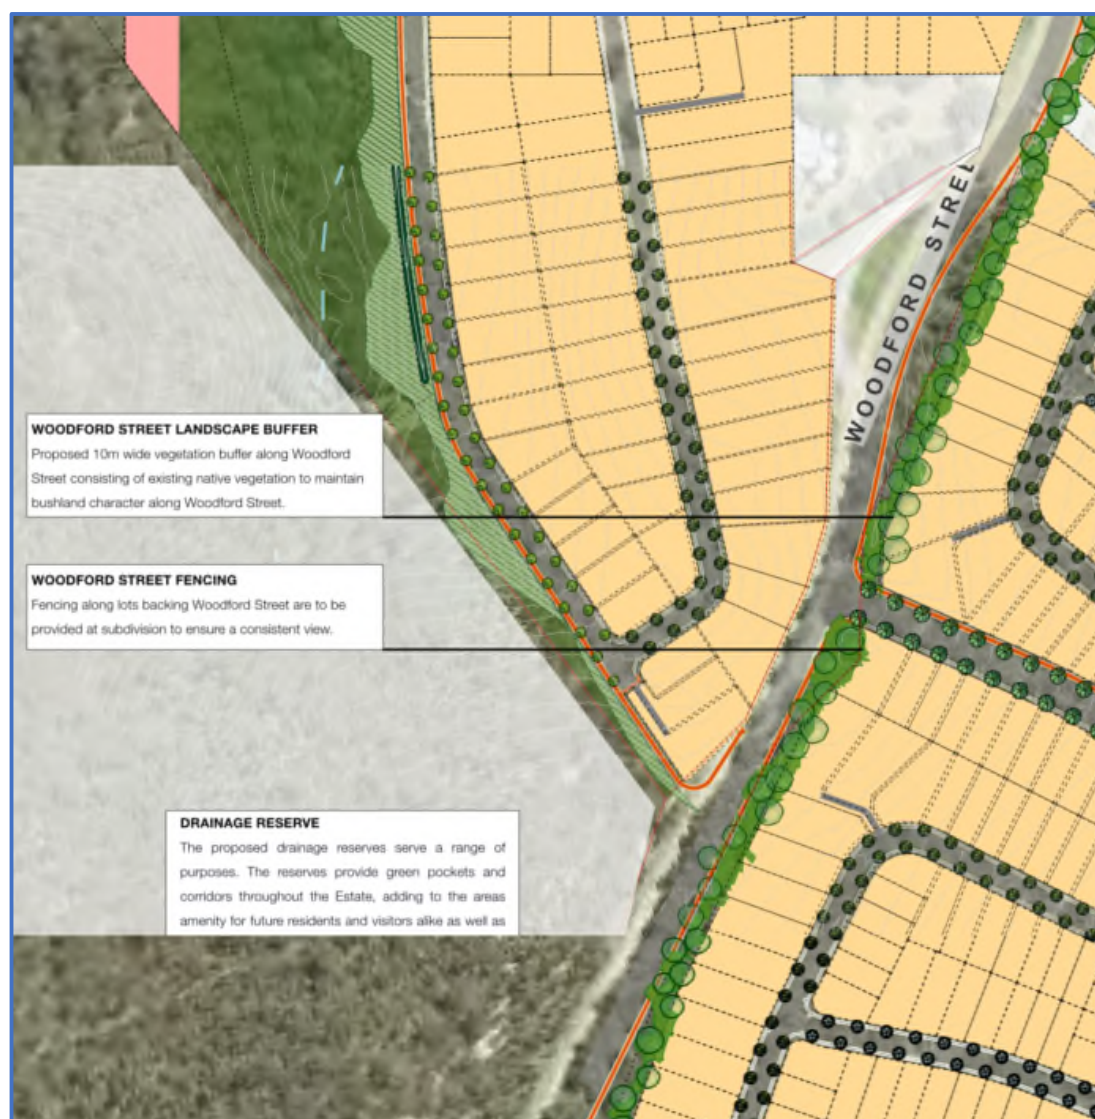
Woodford Street Landscaped Buffer (Source – Landscape Plans, Sht LP06)
